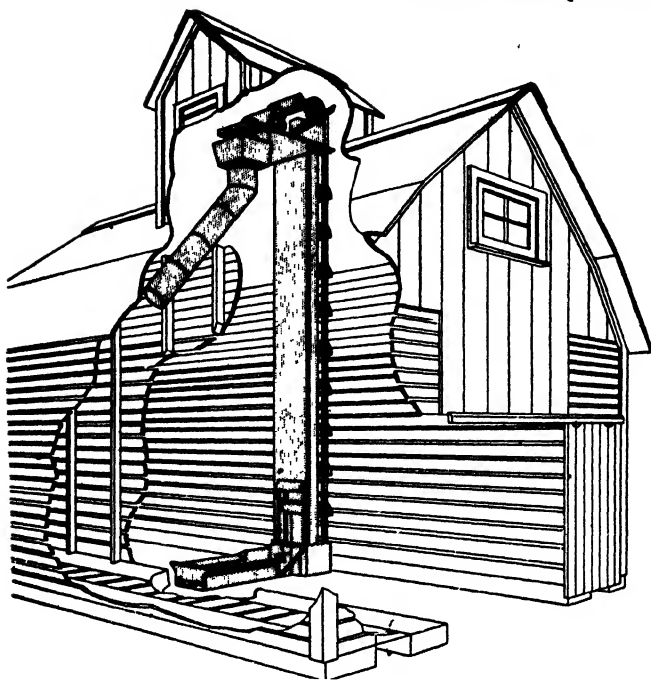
Bucket elevator for small grain installed in driveway of barn. (King and Hamilton Co.)
